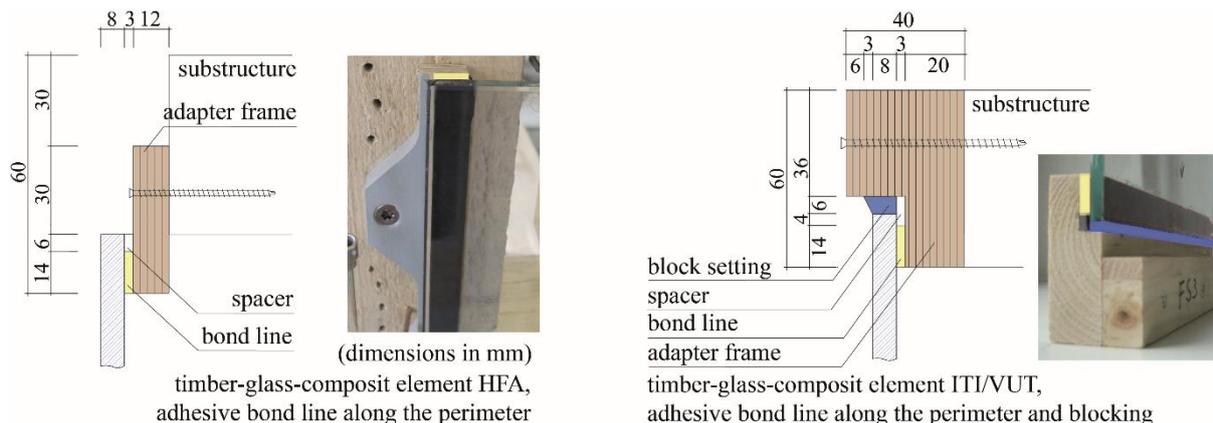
left: TGC element HFA, adapter frame with tooth profile; adhesive bond line along the perimeter; right: TGC element ITI, L-shaped adapter frame; adhesive bond line along the perimeter and blocking [9]
